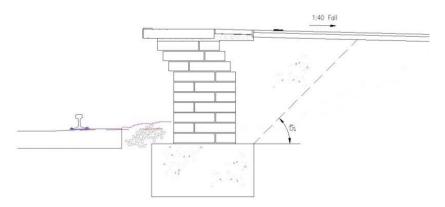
Cross-section of Network Rail standard design for a traditional front wall platform
